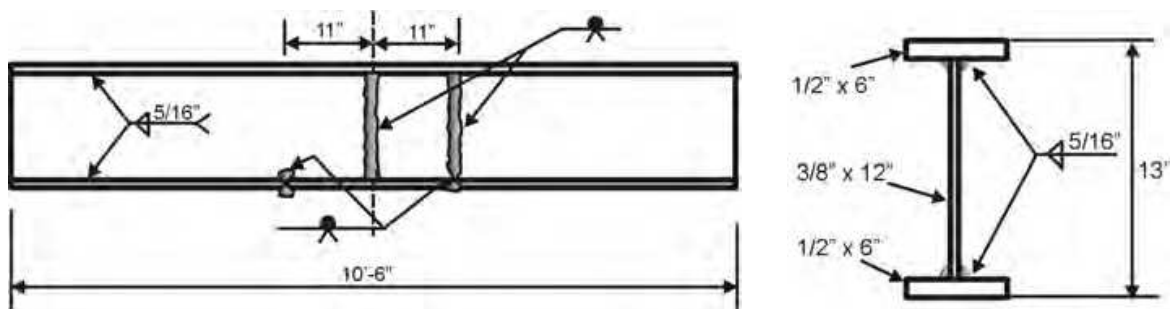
Groove welded beam for residual stress measurement (unit: inch; 1 inch=25.4mm)
